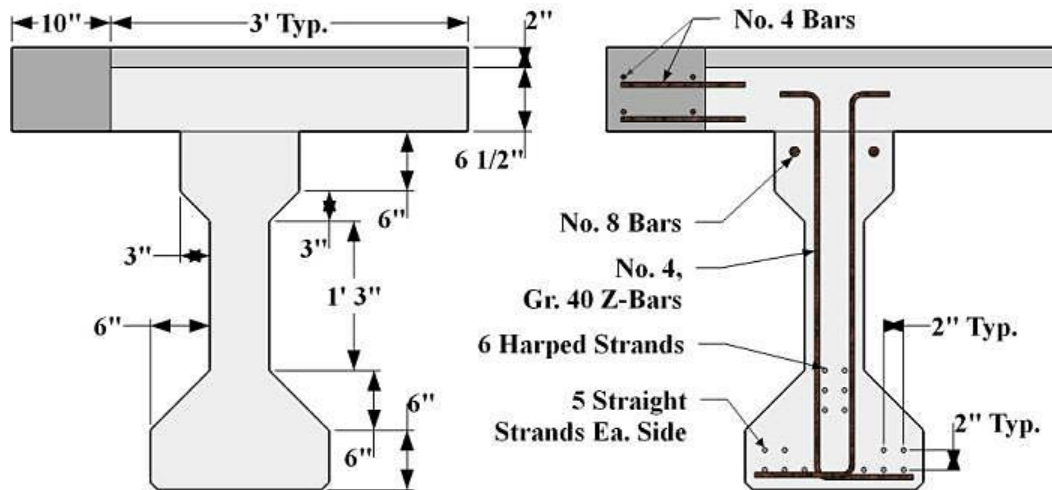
AASHTO Type II Girder Dimensions, Main Reinforcement, and Supplemental Deck
